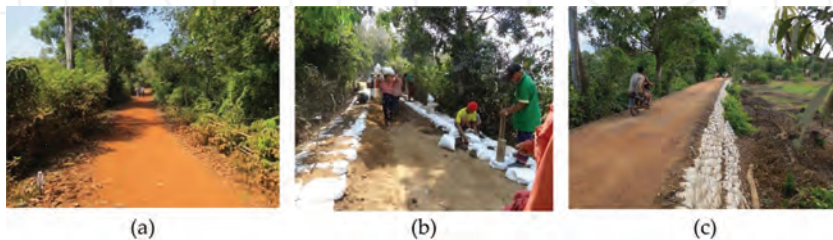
Construction of road embankment with Do-nou retaining wall: (a) Before construction; (b) construction of the embankment with Do-nou retaining wall; (c) after construction.
